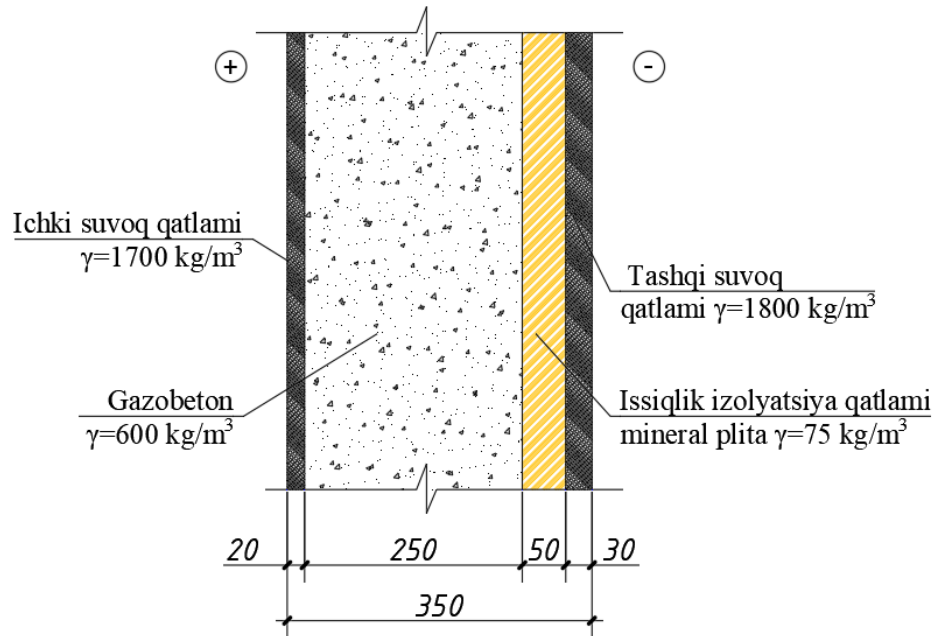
A thermal insulation layer is placed on the outside of the continuous aerated concrete wall.
